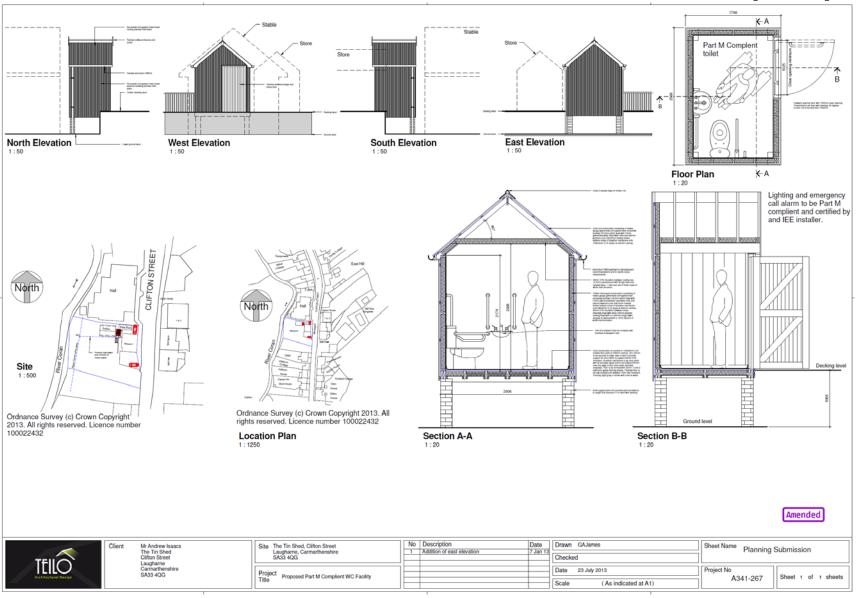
Plans and elevations relating to the proposed toilet at the Tin Shed Museum (Teilo Architects, copied from CCC Planning website)
